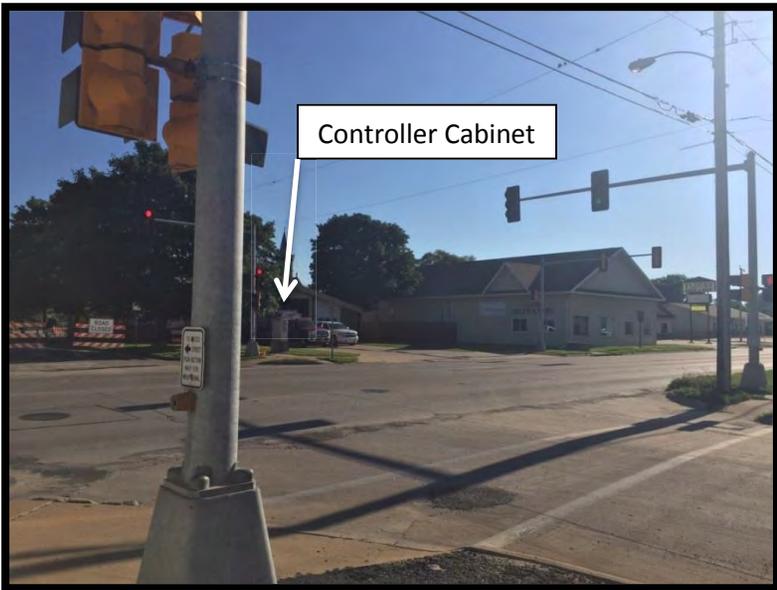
Intersection of 24th Street and Avenue L looking NE
